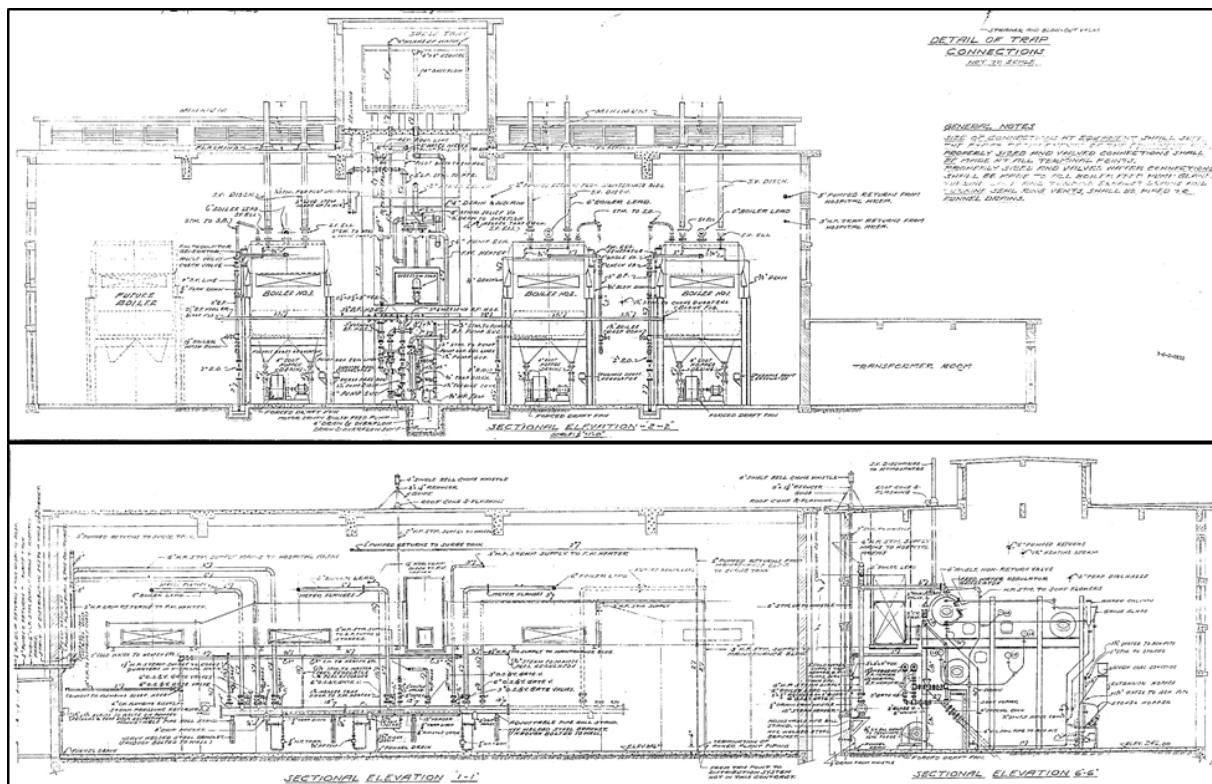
Architectural drawings by Robert & Co. for the boiler plant, shown in plan and section (VA).
